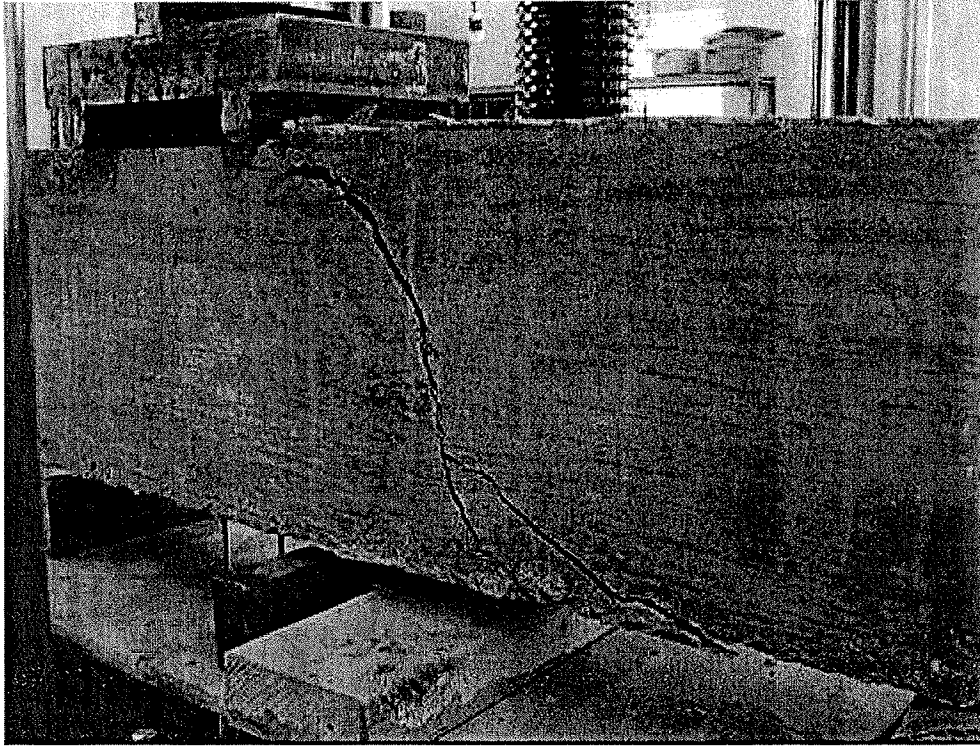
Flexural and shear cracks in the BRC -3 beam.
